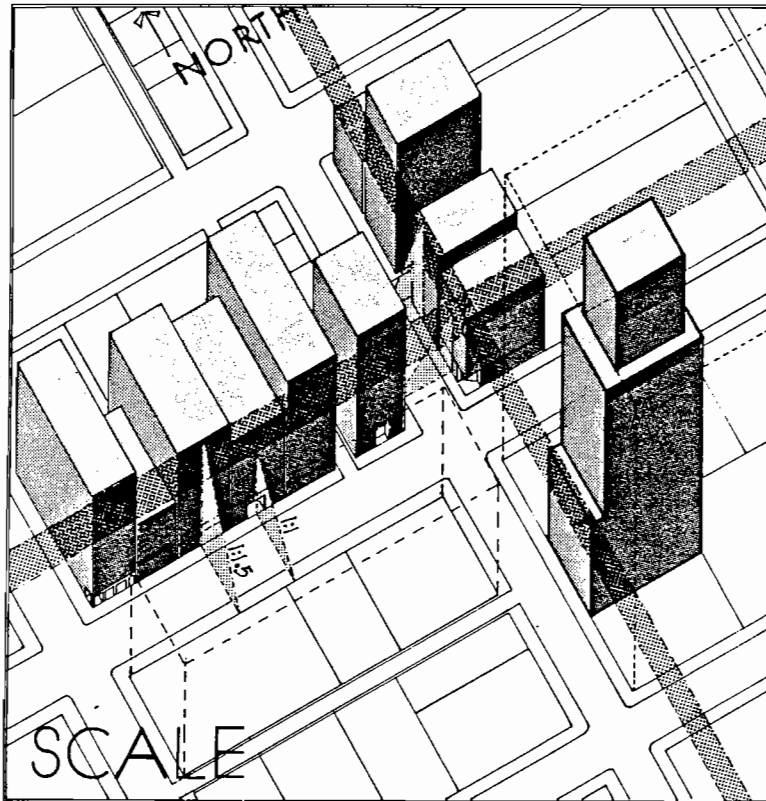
Street wall heights for both East-West and North-South streets in the Retail District fall within a range of 1:1 and 1:15 of street width. The tower portions of buildings rising above the street wall height to the maximum height limit can be accommodated along these streets provided sufficient setbacks are maintained.
